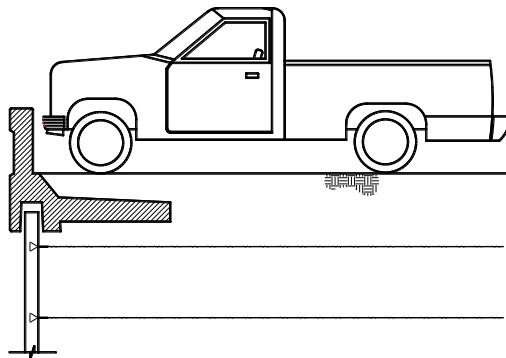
Sketch of an MSE retaining wall with a barrier-moment slab system (2)
